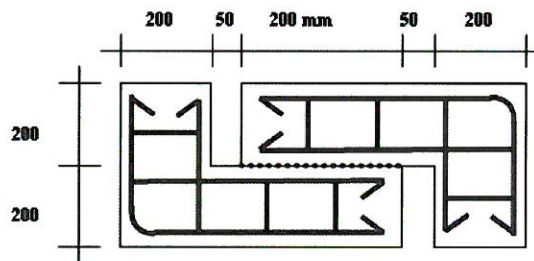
Detailed dimensions of specimens for double L-shaped shear test
